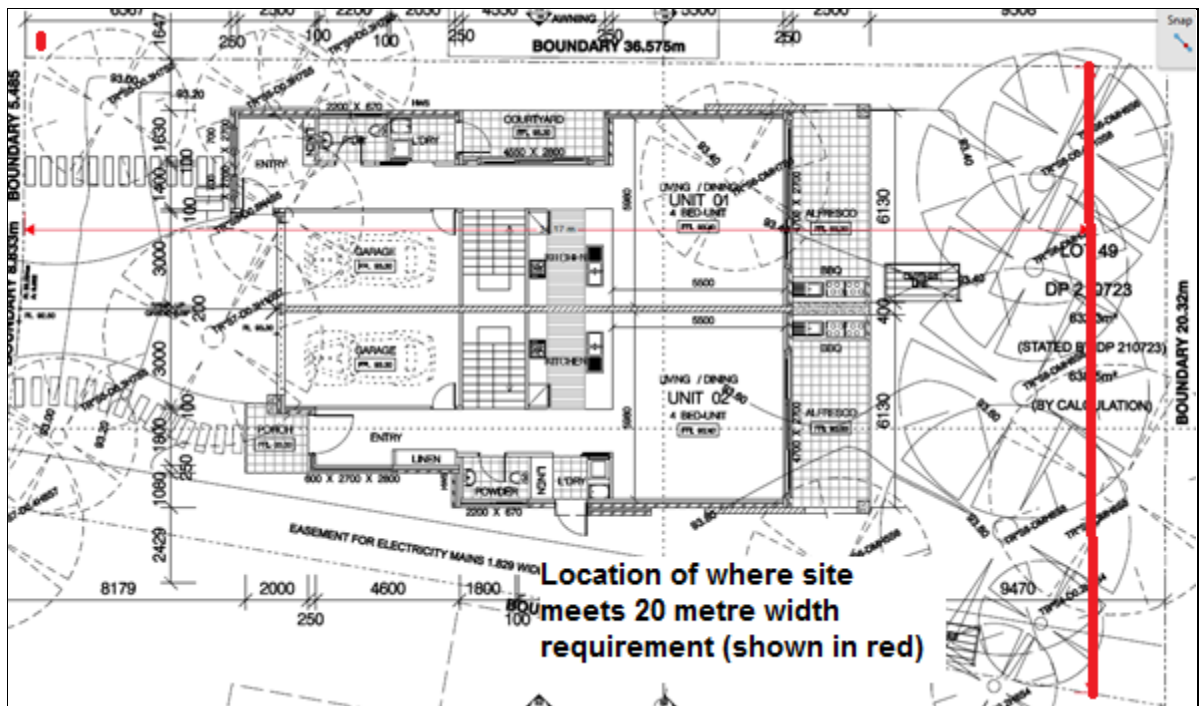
Site plan demonstrating where the 20 metre width is achieved.
